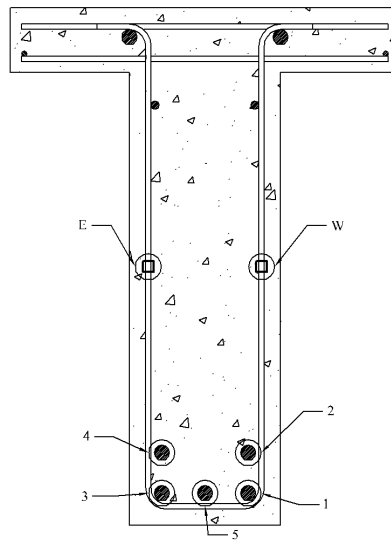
Typical cross-section of specimens strain gage labeling convention
